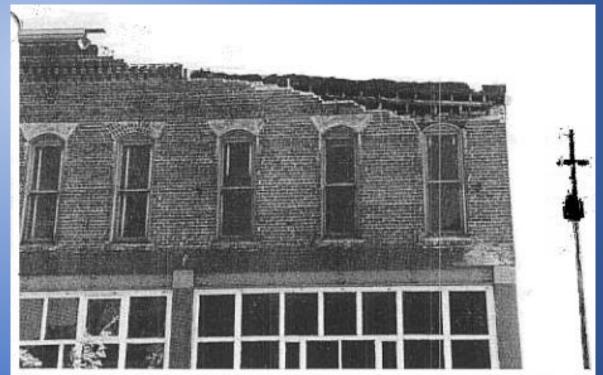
The Stevens Building lost part of its parapet and wall, and suffered large shear/flexural cracks in the storefront brick piers.
